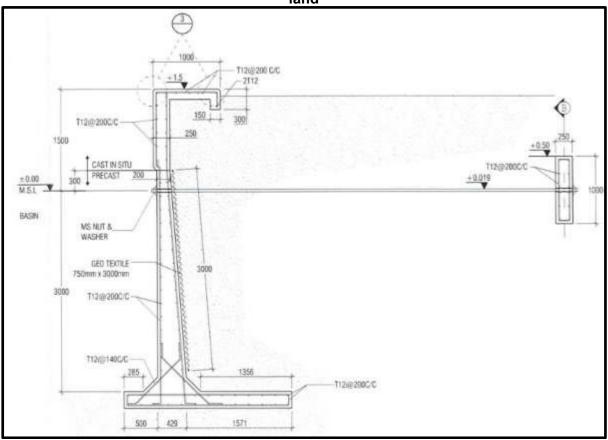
Design details of the quay wall protecting the northern side of the reclaimed land
